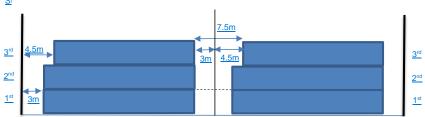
Example of side building setback. Front view showing side setback (where building length sie less than 16m).
